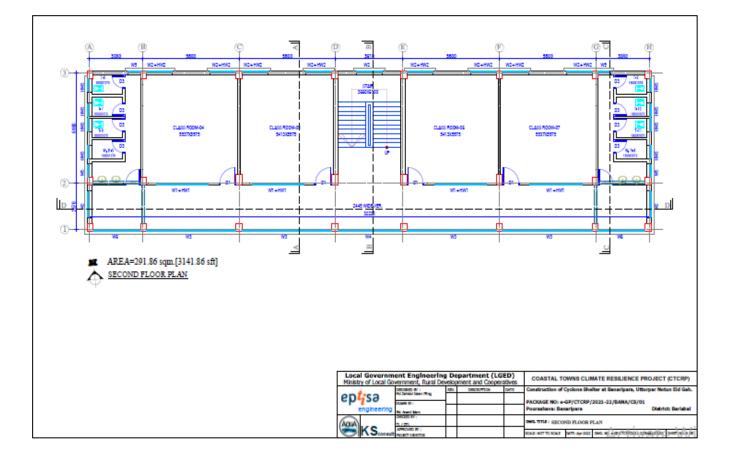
Layout Plan of Second Floor of the proposed Cyclone Shelter
